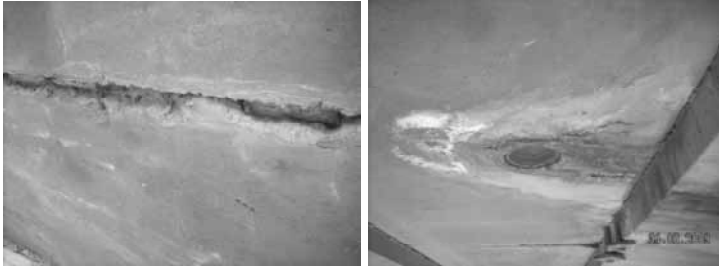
Damages at the joint between two pre-slabs and moisture at the area adjacent to gutter
